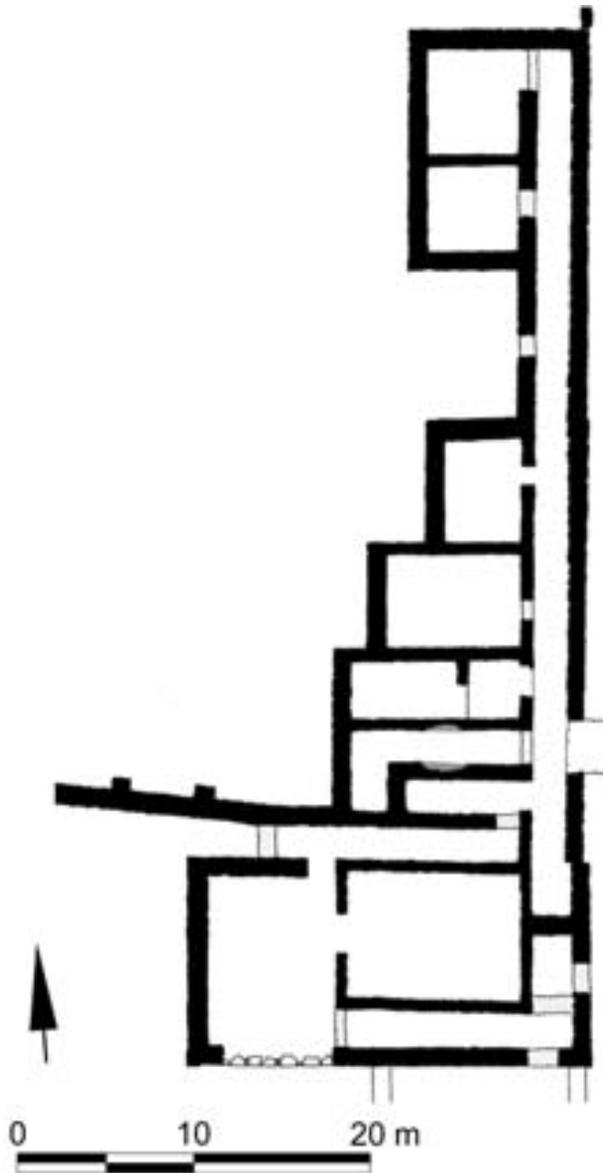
Buildings E and Z at Gla, adapted from Iakovides 2001, plan 19
